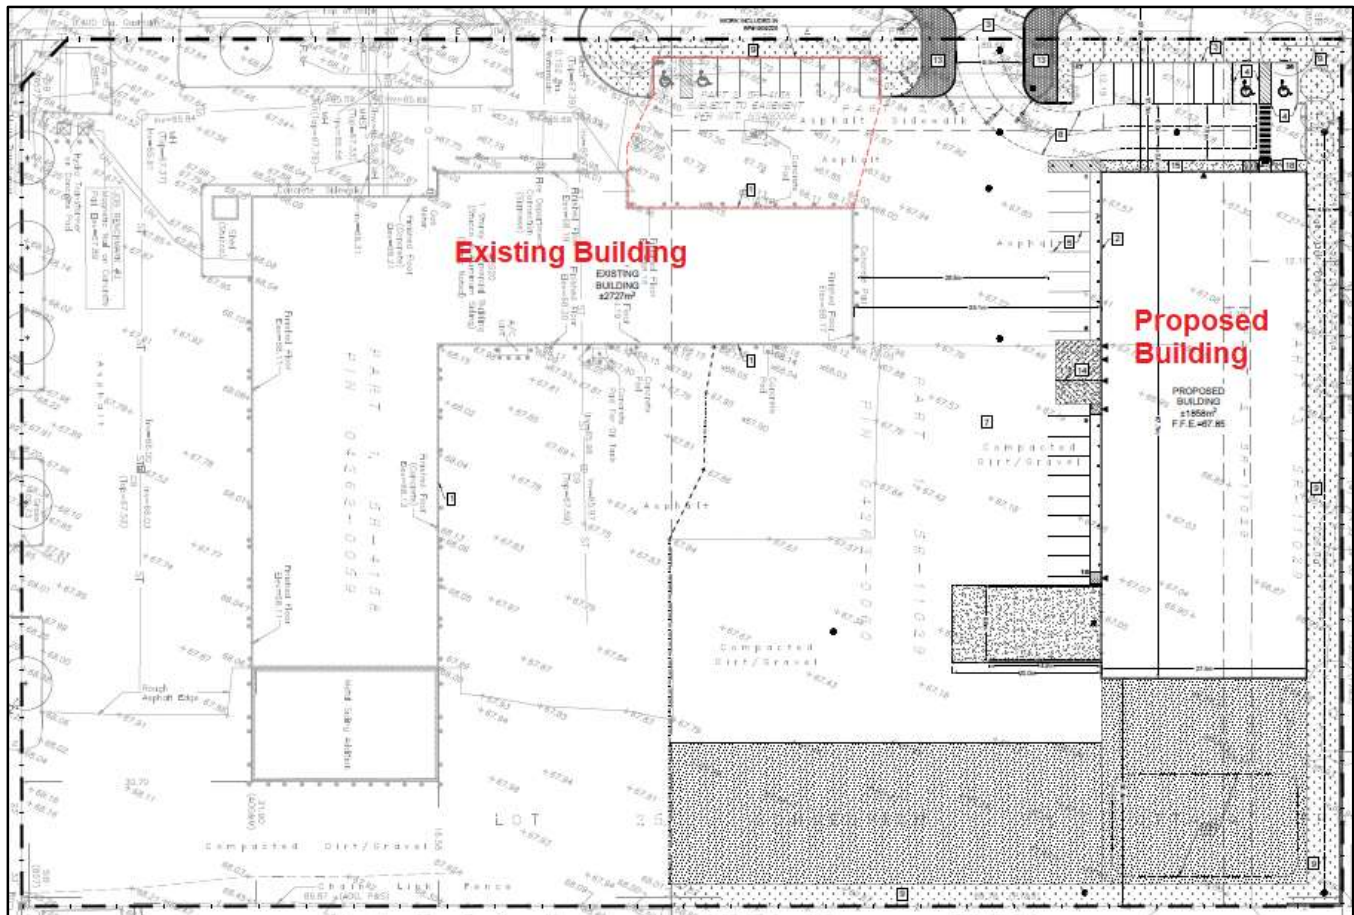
Exhibit L: Excerpt from Site Development Plan for the Proposed Redevelopment
